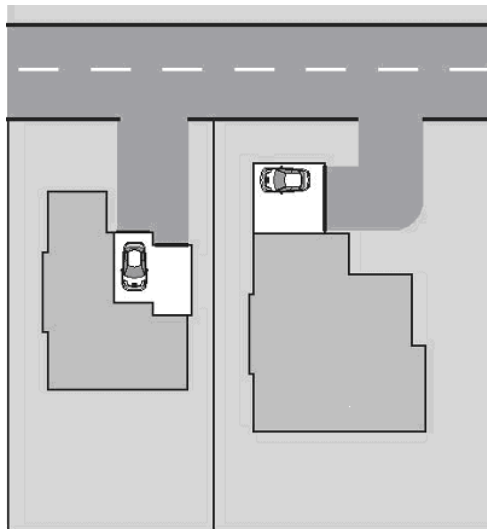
Plan View; Garages appear less prominent when facing away from or set back from the street.
